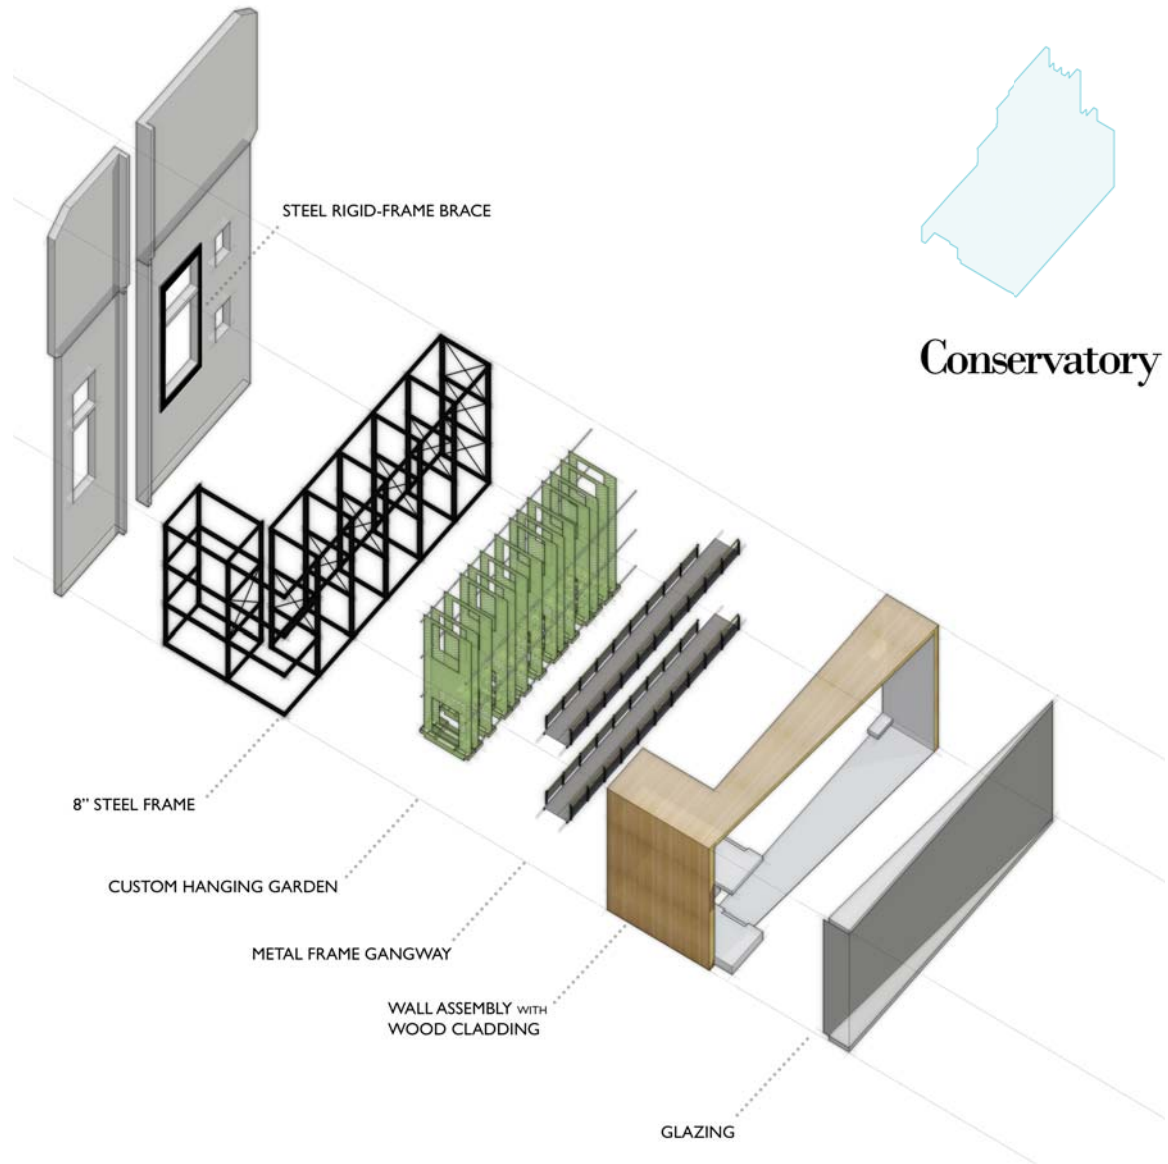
Exploded axonometric drawing showing how the 'graft' intervention works. A rigid steel frame is bolted to the existing shear wall, then the area of concrete within the frame is removed and the new structural steel frame is attached.
